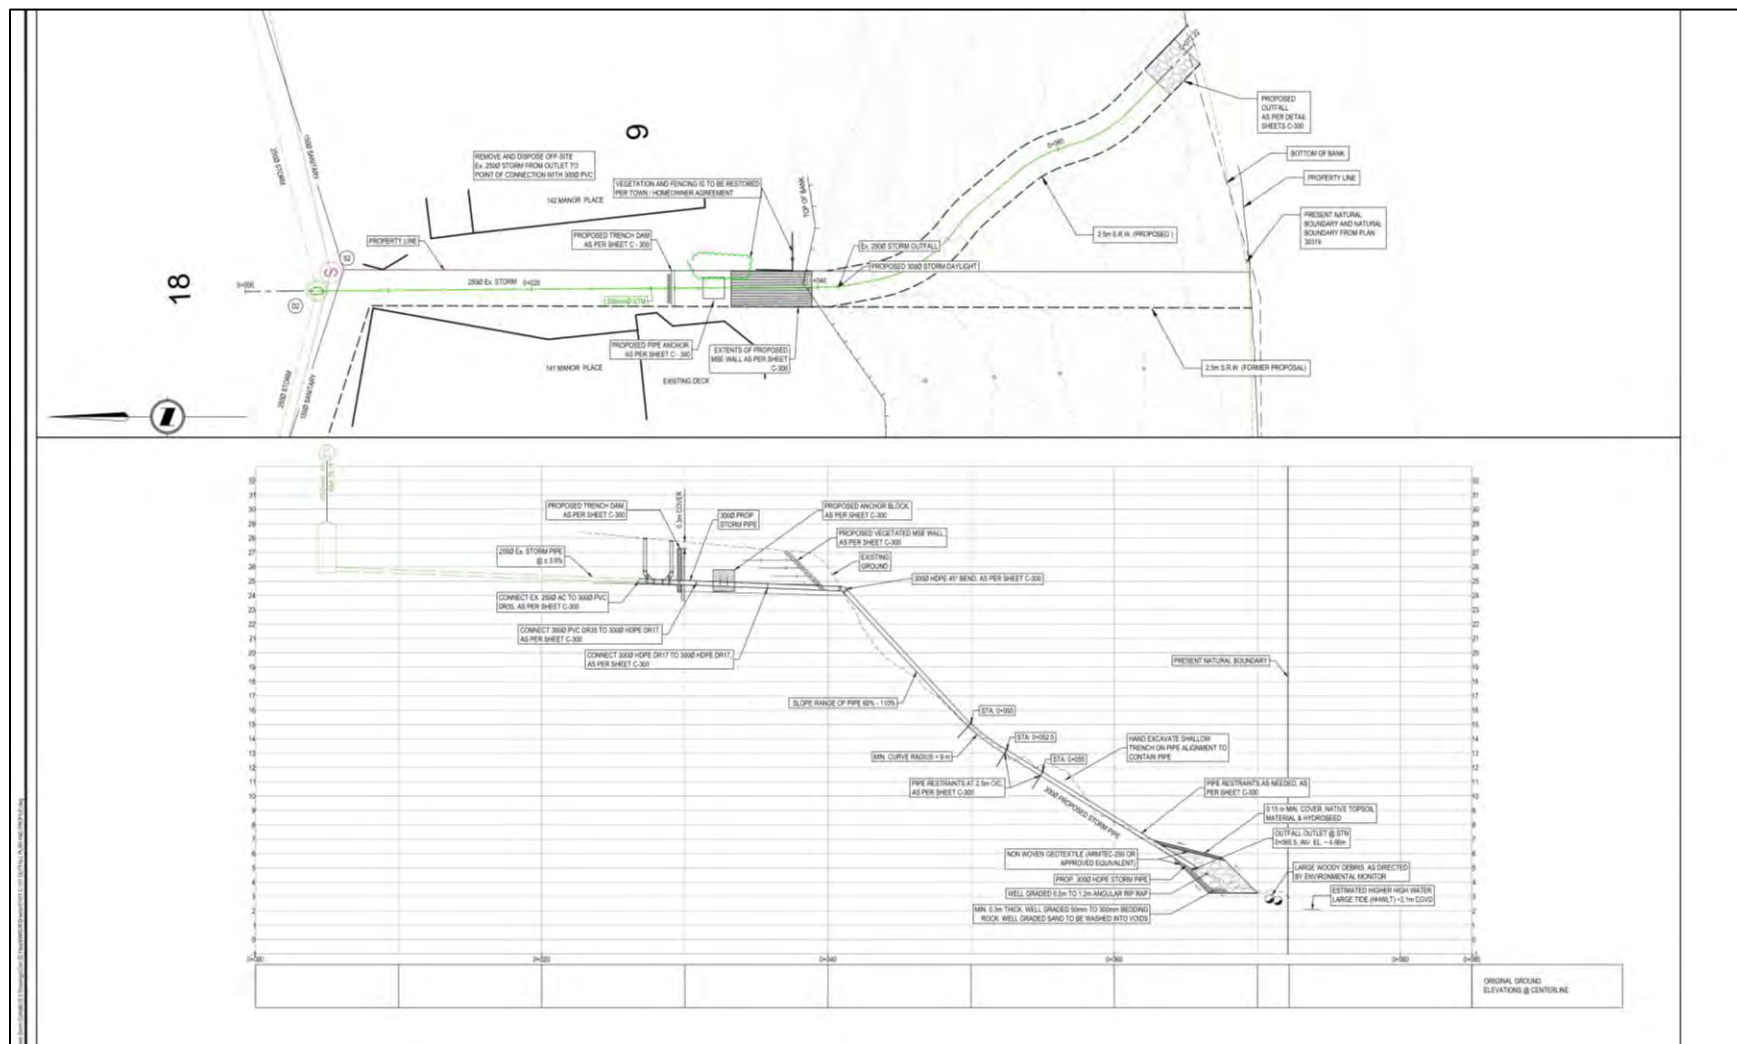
Typical design of stormwater pipe running down a steep slope and discharging through a rock exfiltration gallery.
